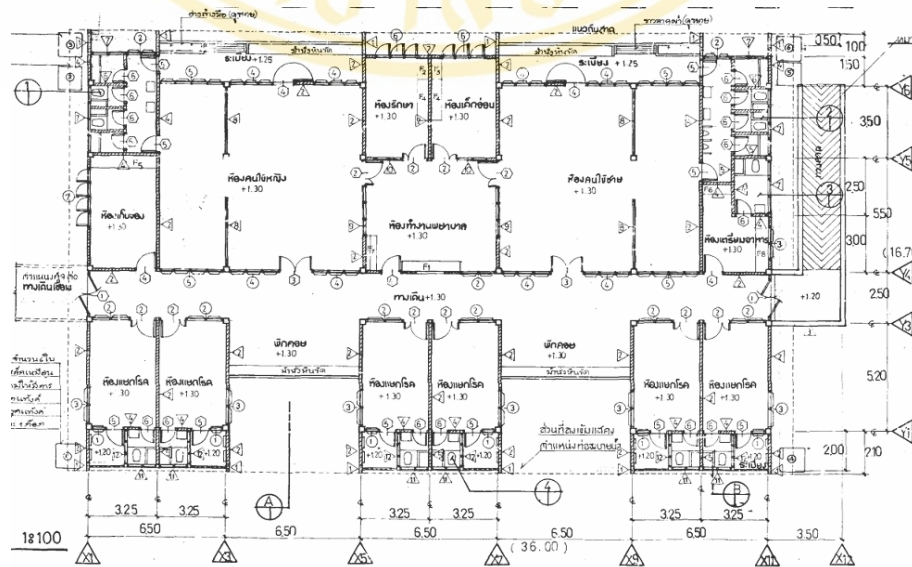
First floor plan of inpatient ward building number 2731/2530
